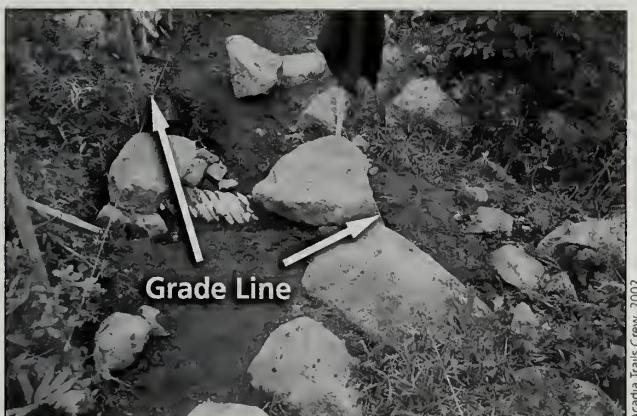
A new 2002 pipe culvert on Jordan Pond Path (#39). The photo shows header stones before crush and gravel surfacing, which will completely cover the pipe. Note lintel stones meet grade line at outside edge.
